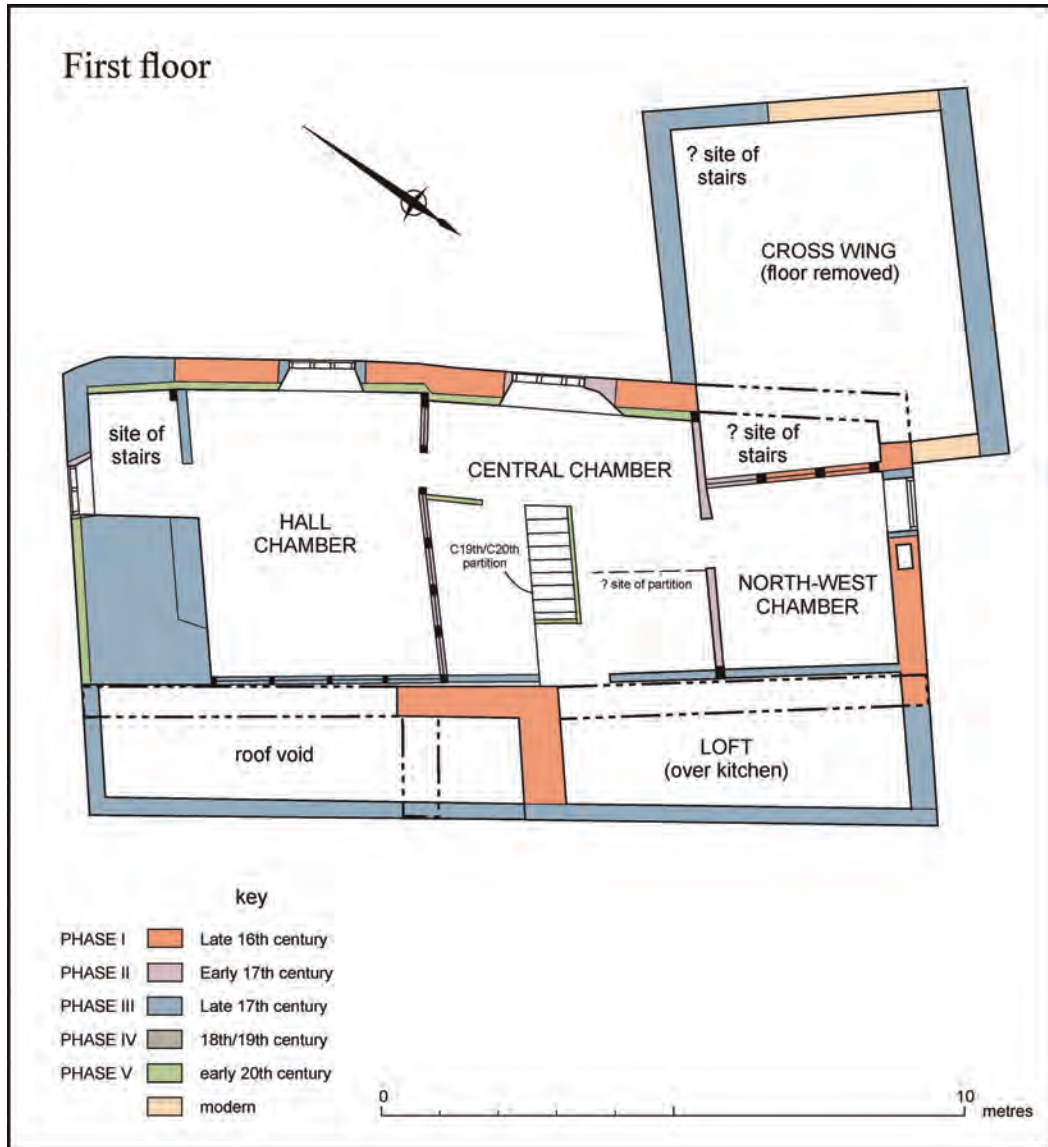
First-floor plan showing suggested phasing (graphic: Tony Ives).
